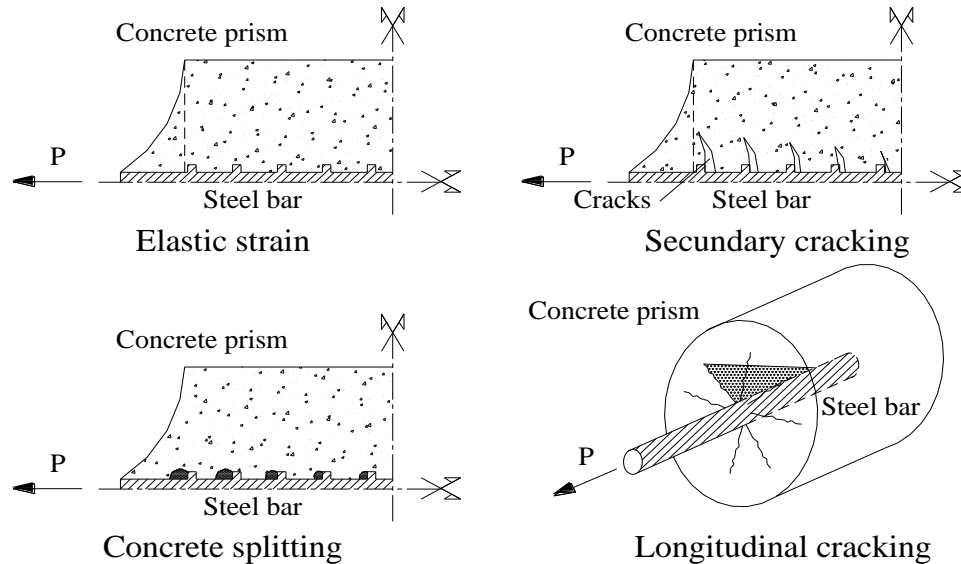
Bond mechanism failures (adapted from Rots [5]).
